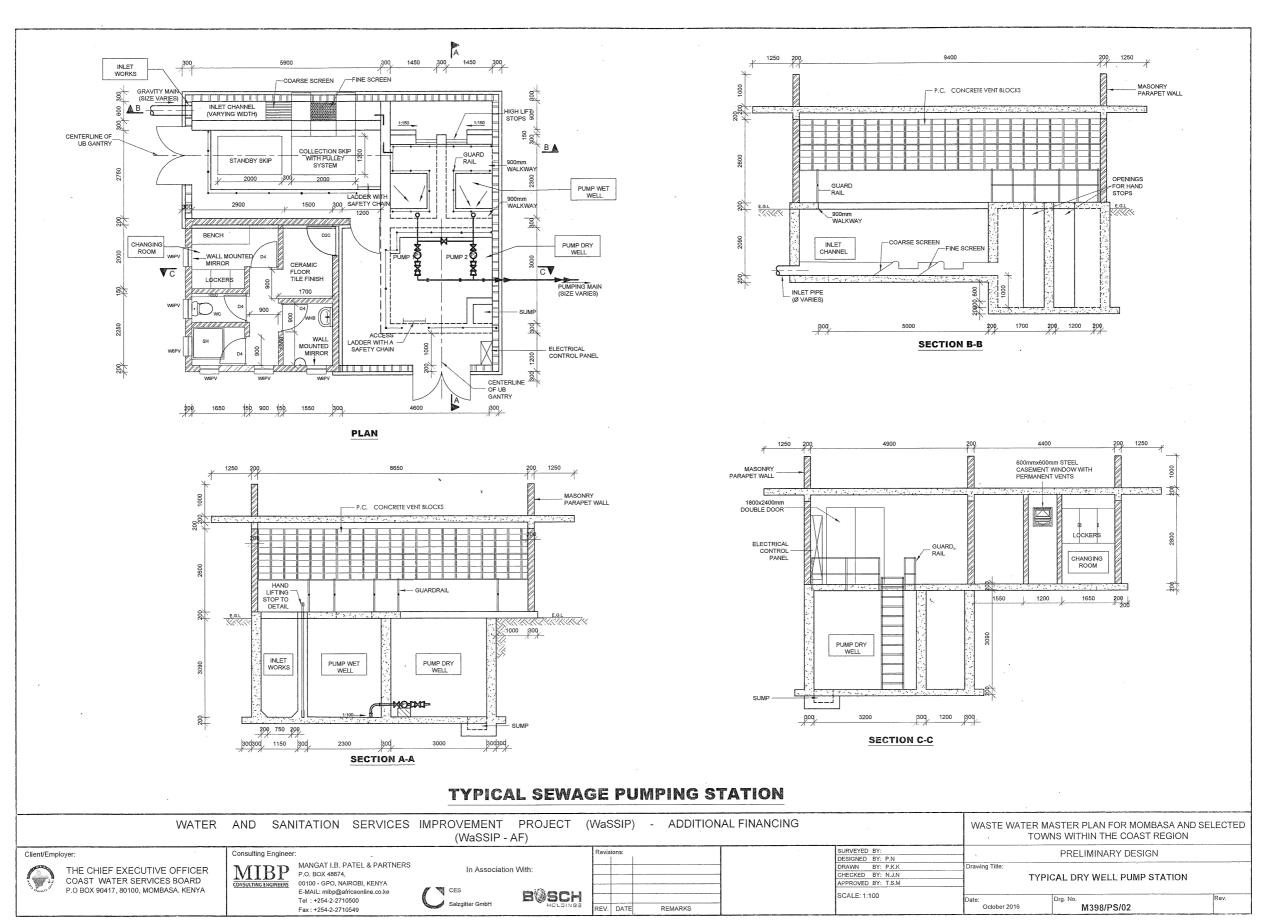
Layout Plan and Sections of a Centrifugal Pumping Station
